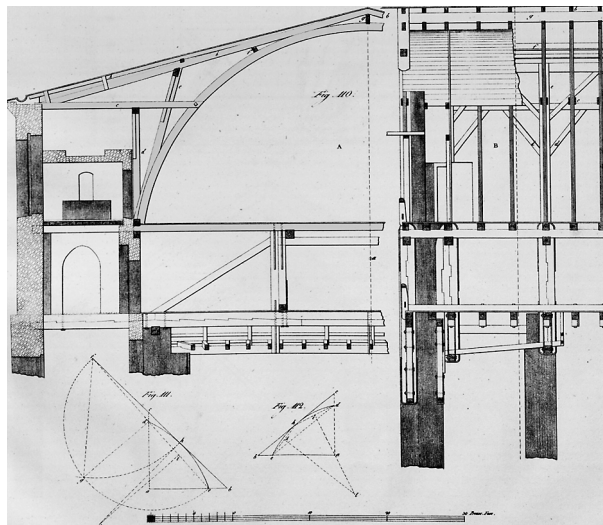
Berlin, Schauspielhaus, roof over the painters’ hall. [12] pl. XII, Fig. 110
